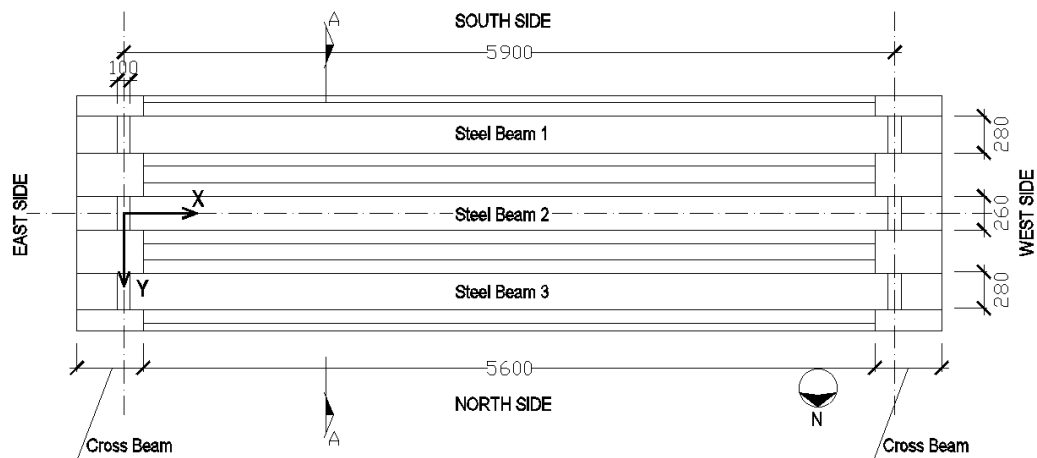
LB1 - Bottom view. Dimensions of LB1 and position of beam 1, beam 2 and beam 3.
